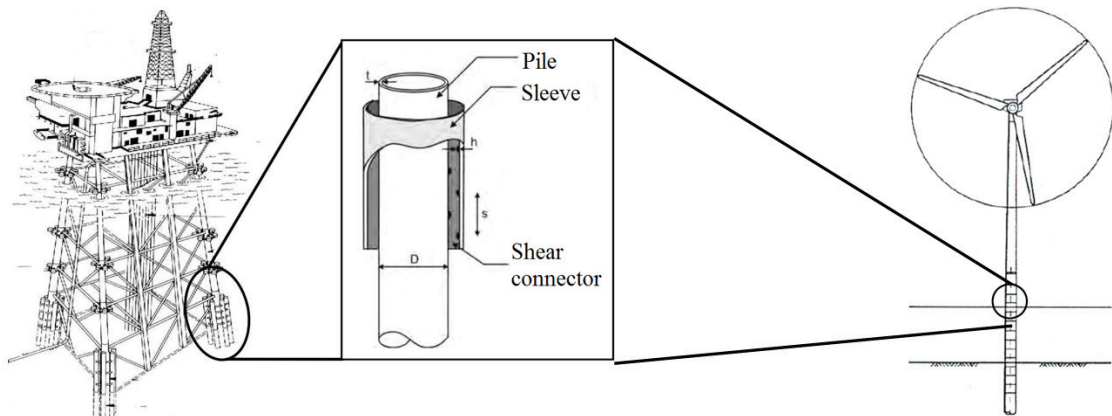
The connection in offshore structures Fig 2 The connection in wind turbine towers
